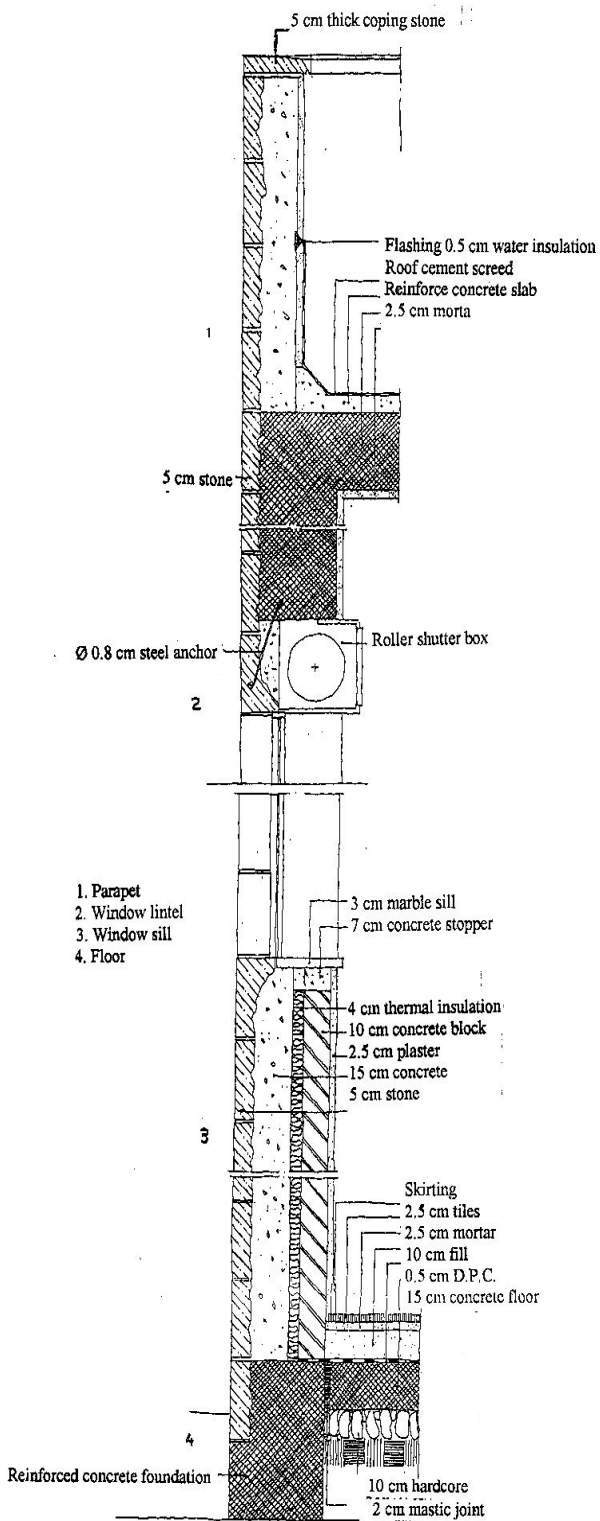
typical section through a stone facing wall in Jordan approx. scale: 1:200 source: author 2004.
